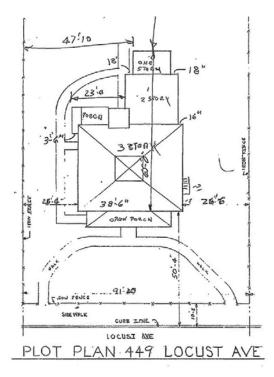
Sketch plan of the property from a 1963 zoning permit application.
